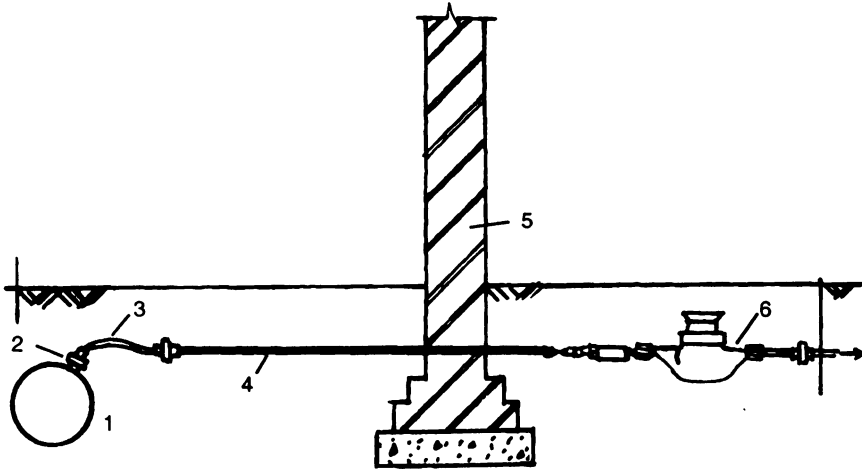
House water supply from street mains: 1. Street mains, 2. Ferrule, 3. Goose neck, 4. PVC (noncorrodable) connecting pipe, 5. Boundary wall, 6. Watermeter.
